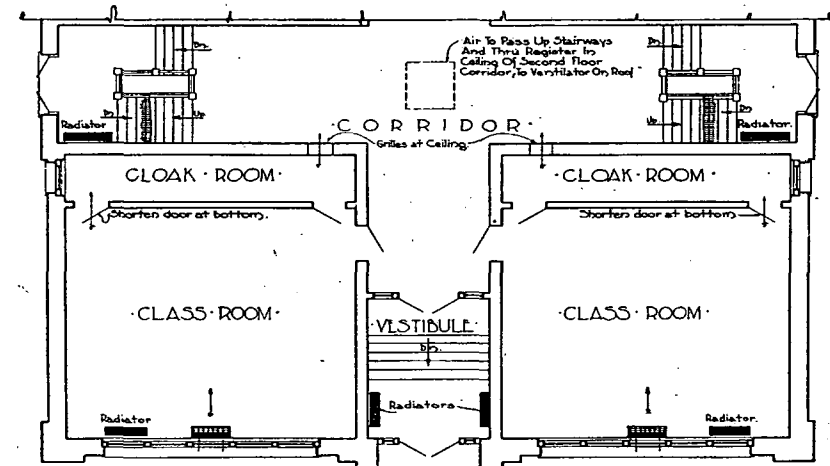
SCHOOL ROOM PLAN SHOWING LOCATION OF UNITS
